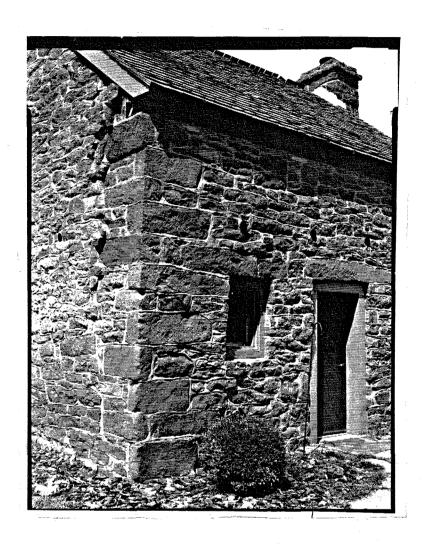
Darnall Farm, perspective detail of quoining on southwest corner of slave quarter looking northeast.
